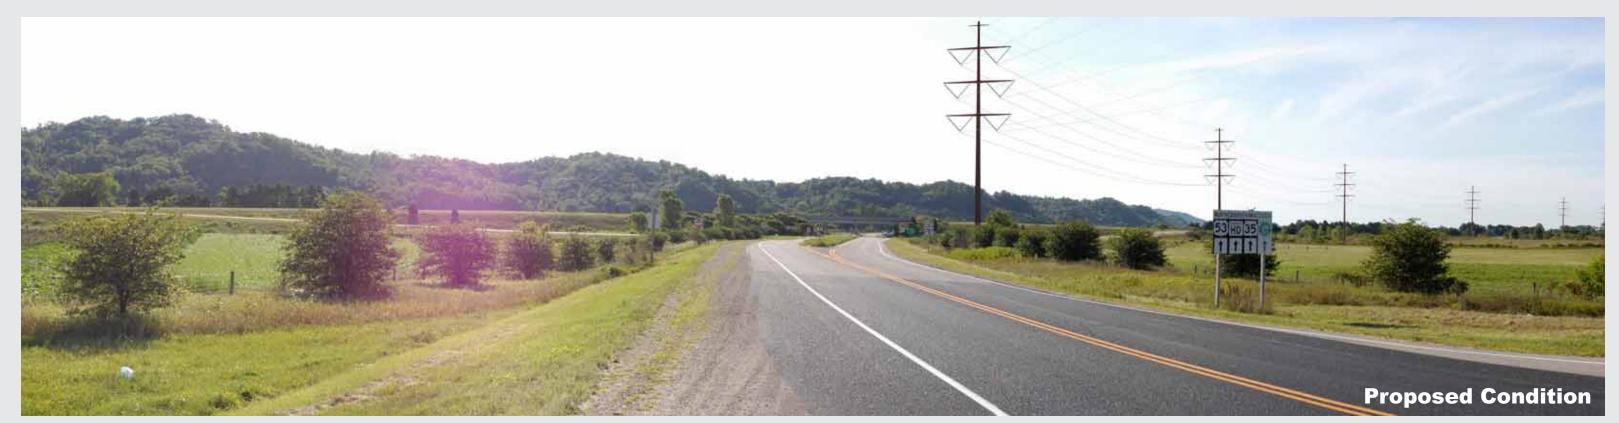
Great River Road 1.0 mile east of Black River, looking east. 345 / 161 kV line constructed on low profile H-frame structures 350 feet north (right) of road.
